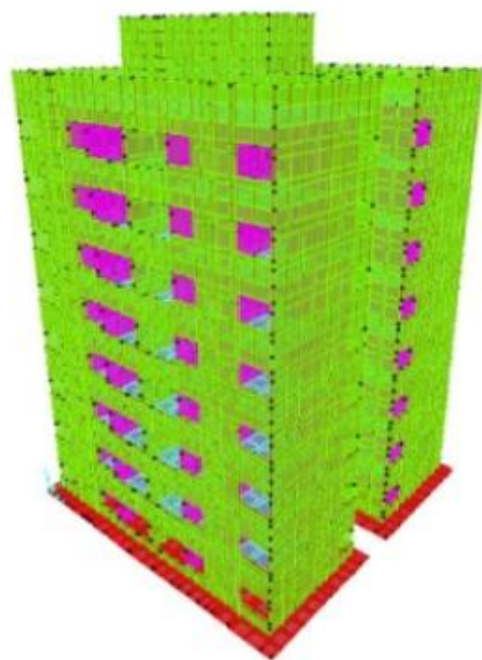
Mat foundations and locations of settlement bolts and concrete walls.
